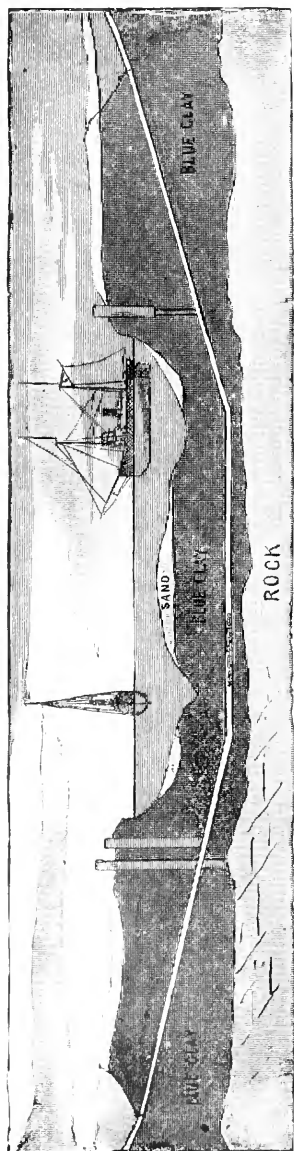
LINE OF EXCAVATION OF THE ST. CLAIR TUNNEL.
